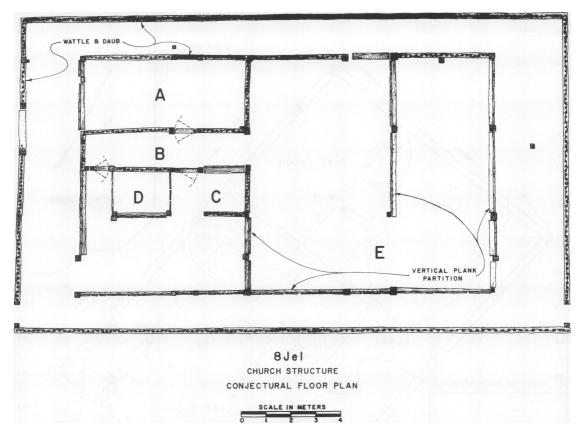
Conjectural floor plan of the church building excavated at San Juan de Aspalaga (after Morrell and Jones, 1970, fig. 4; reproduced with permission of the authors and the Florida Division of Historical Resources).
